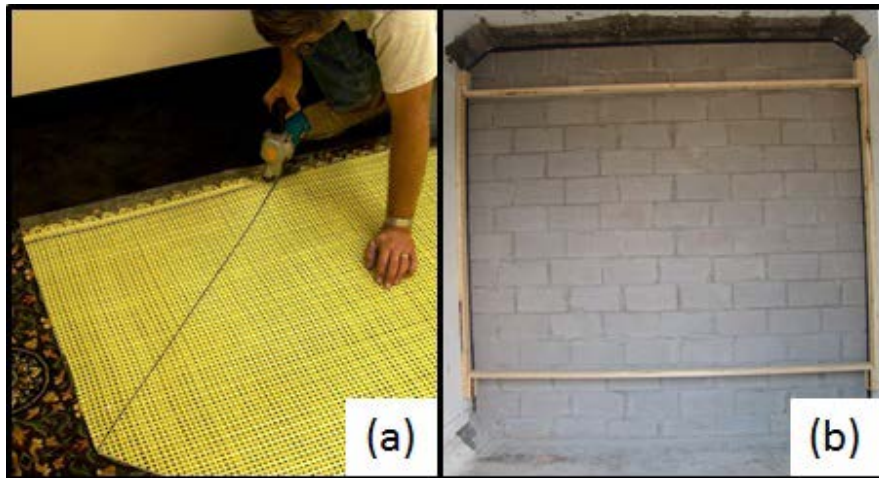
Items to prepare for installation. (a) Reinforced elastomeric film. (b) Temporary bracing installed.
